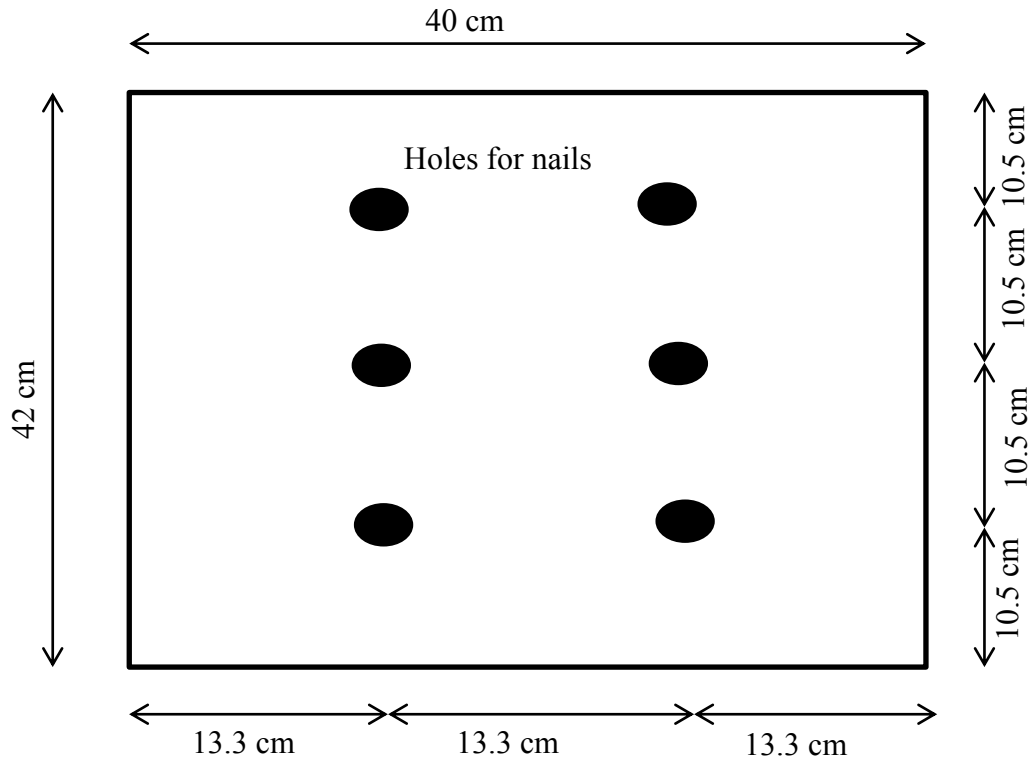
(b) Cross-section of facing of wooden ply.
